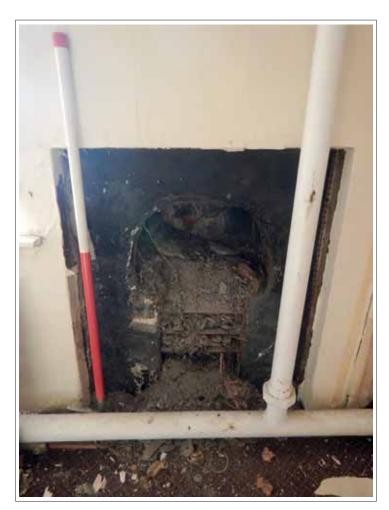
Fireplace to south wall of Room 2.2. 1m scale.
